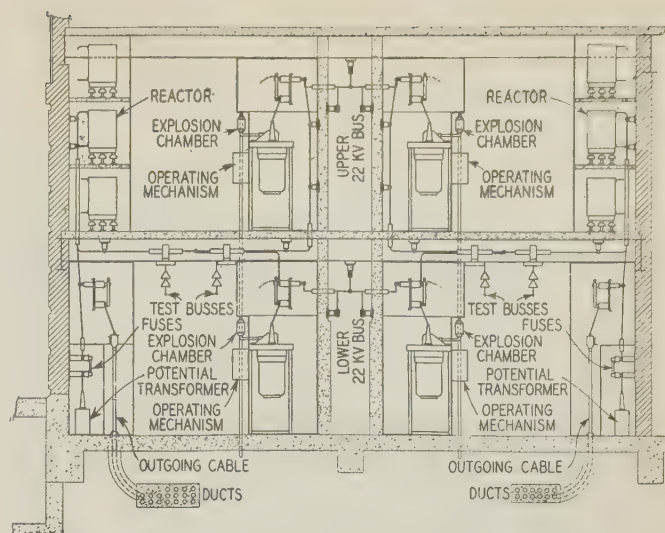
Cross section of switch bay at 22 kv feeder equipment
